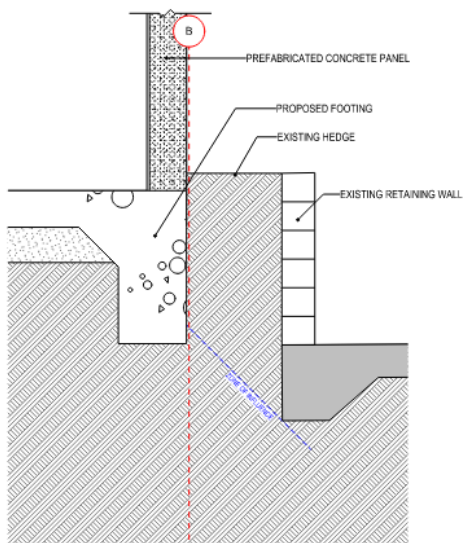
proposed footings and boundary wall to the northern boundary (source: EJE Architects, 01/12/2023)
